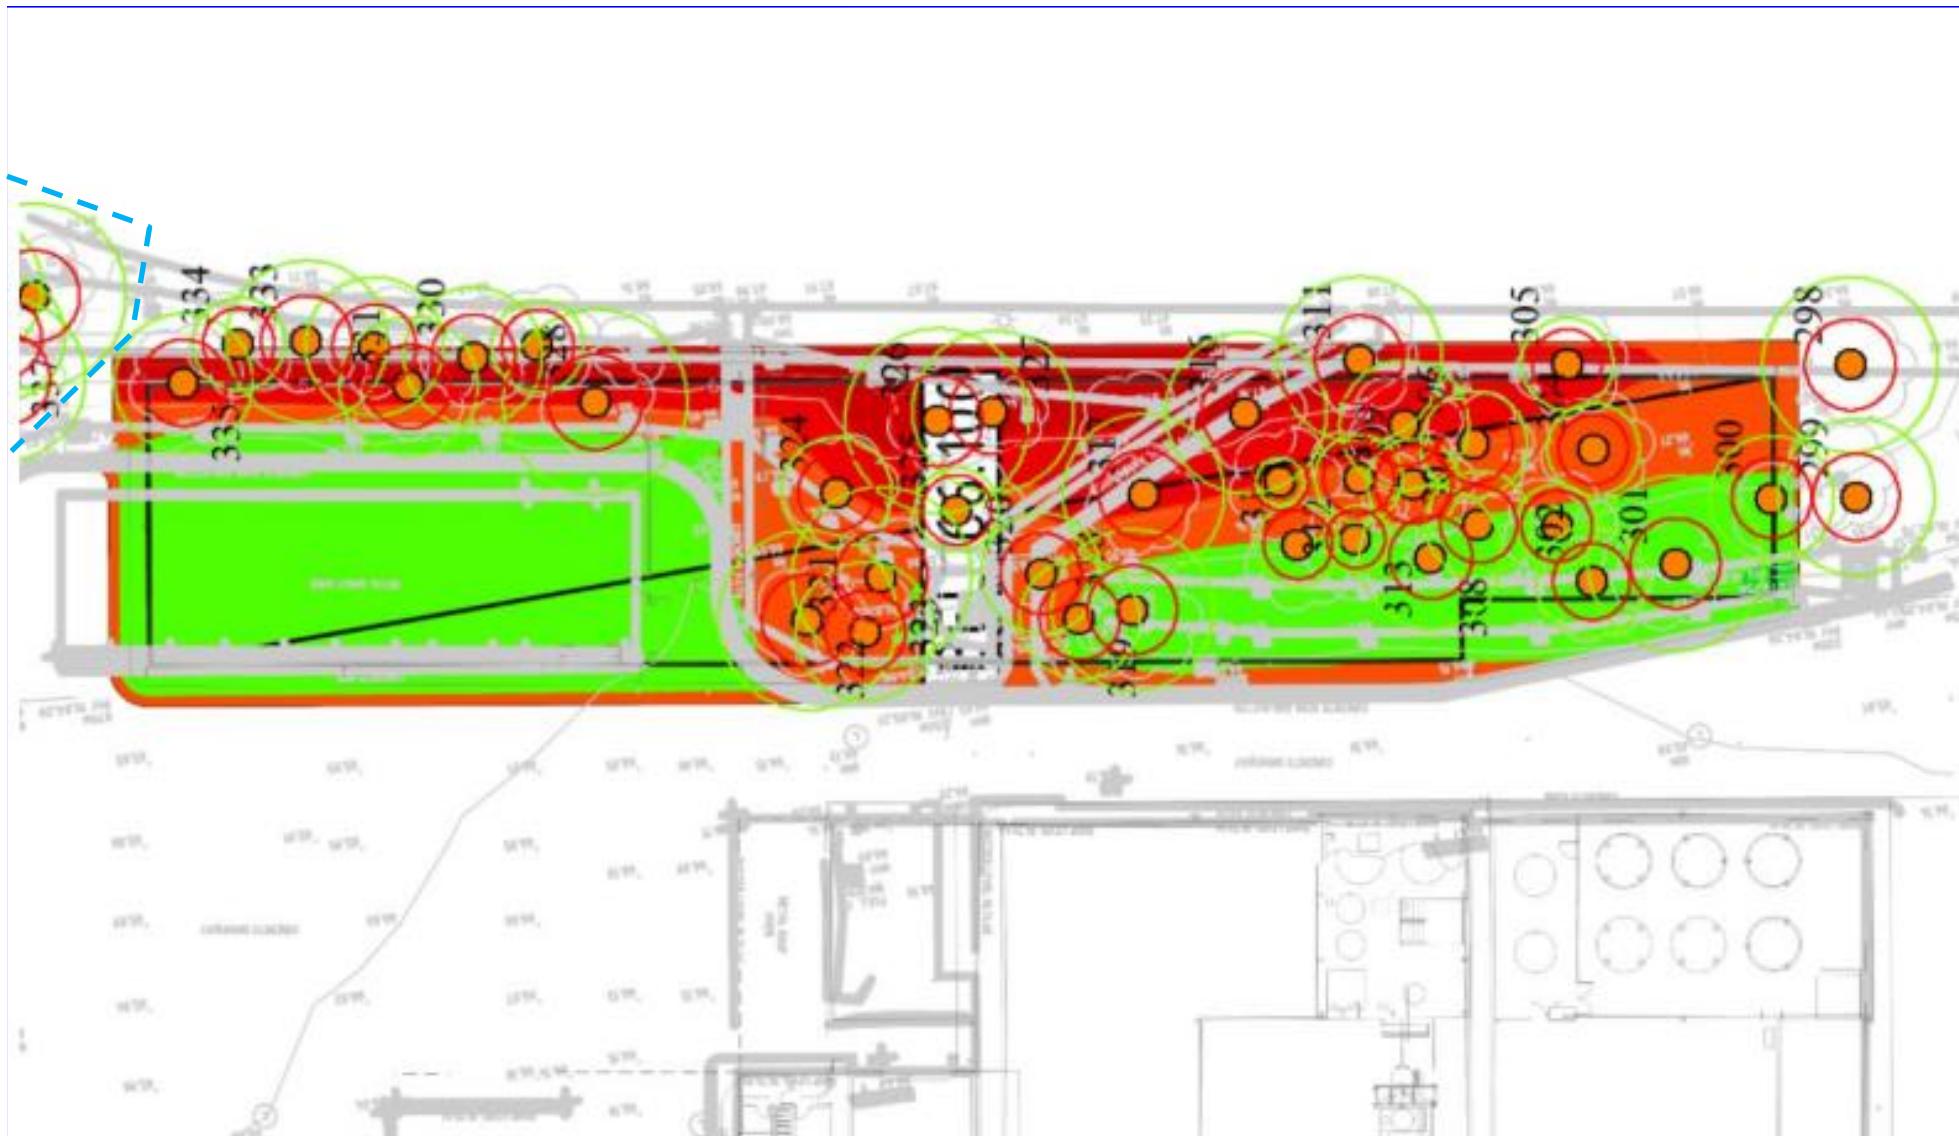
TPZ fencing (Blue) is to be installed around all trees to be retained.
